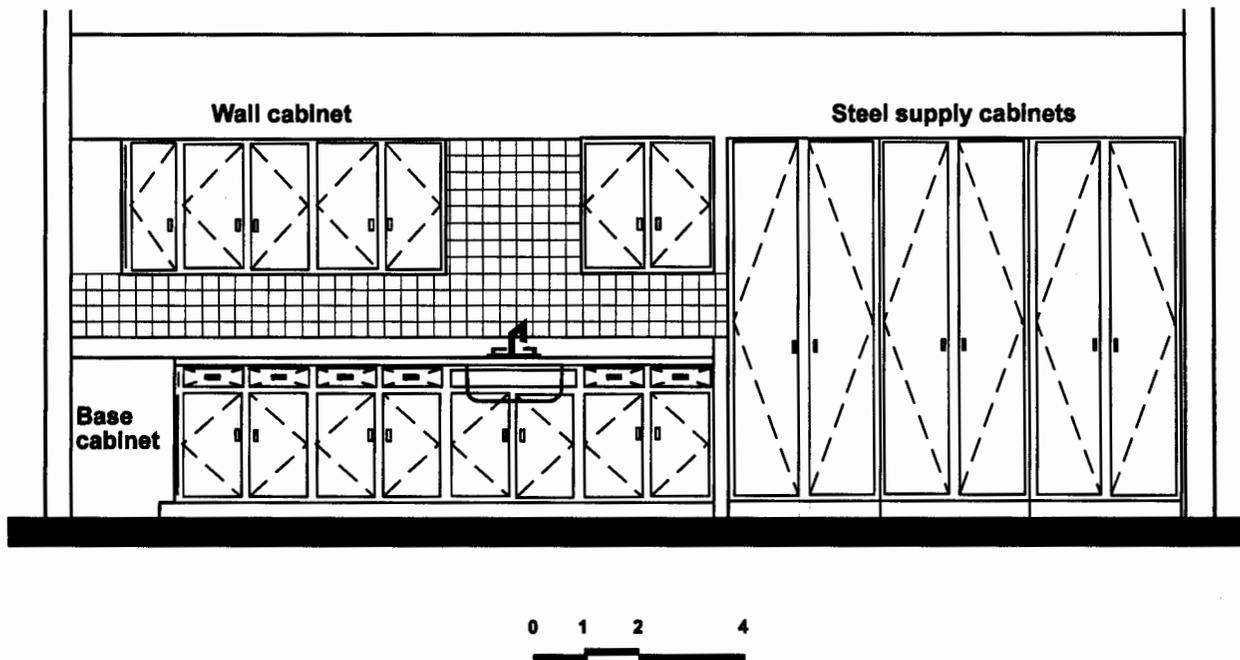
Cross-sectional view of potential processing-room furniture and equipment.
